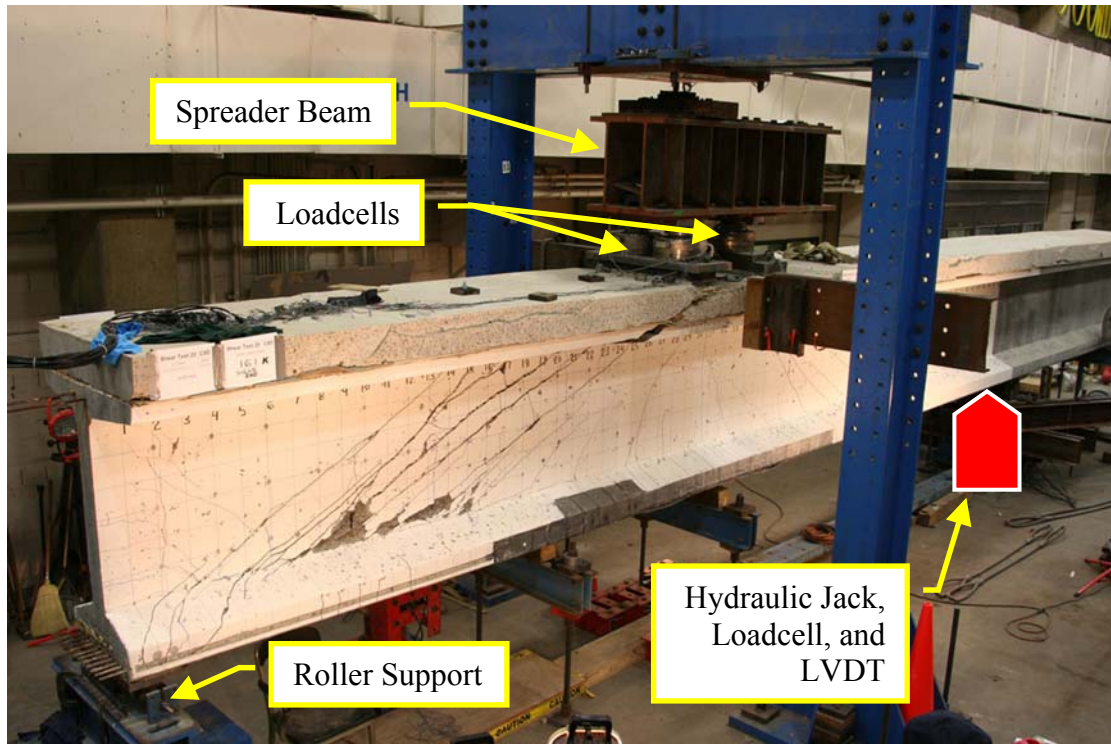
Test Setup on Girder End C8D (Shear Failure Type SW)
